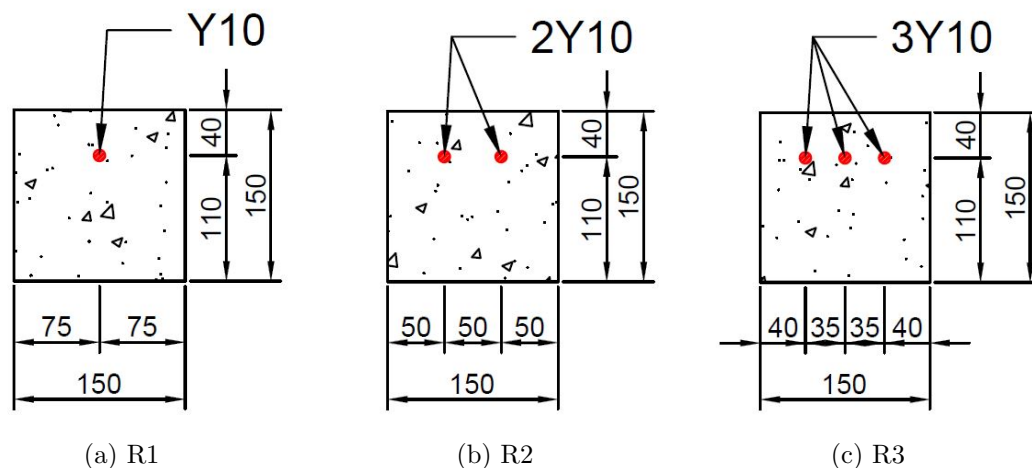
Specimen cross-section configurations (dimensions in mm)
